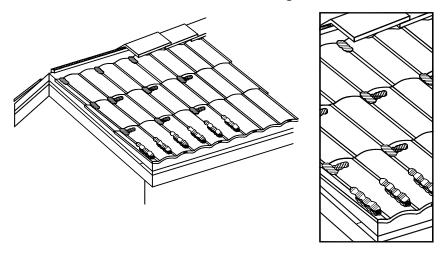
Placement Detail "B" Medium Profile Roofing Tile
